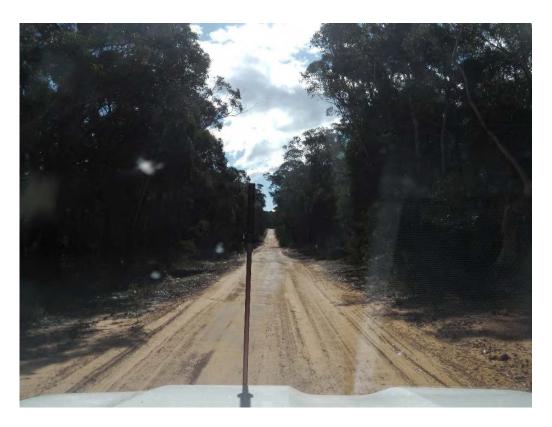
Sunnyside Ridge Road at junction with Blackfellows Hands Track and Beecroft Track – looking north
